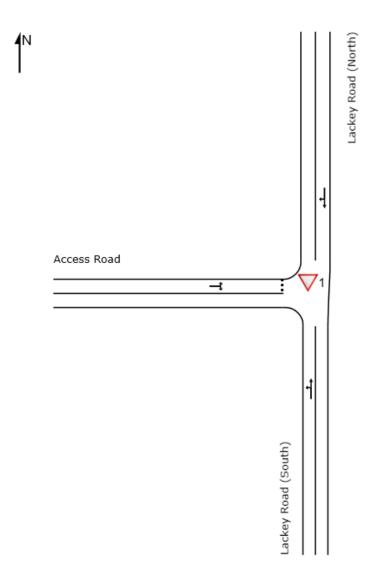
SIDRA geometrical layout – Lackey Road / Access Road
